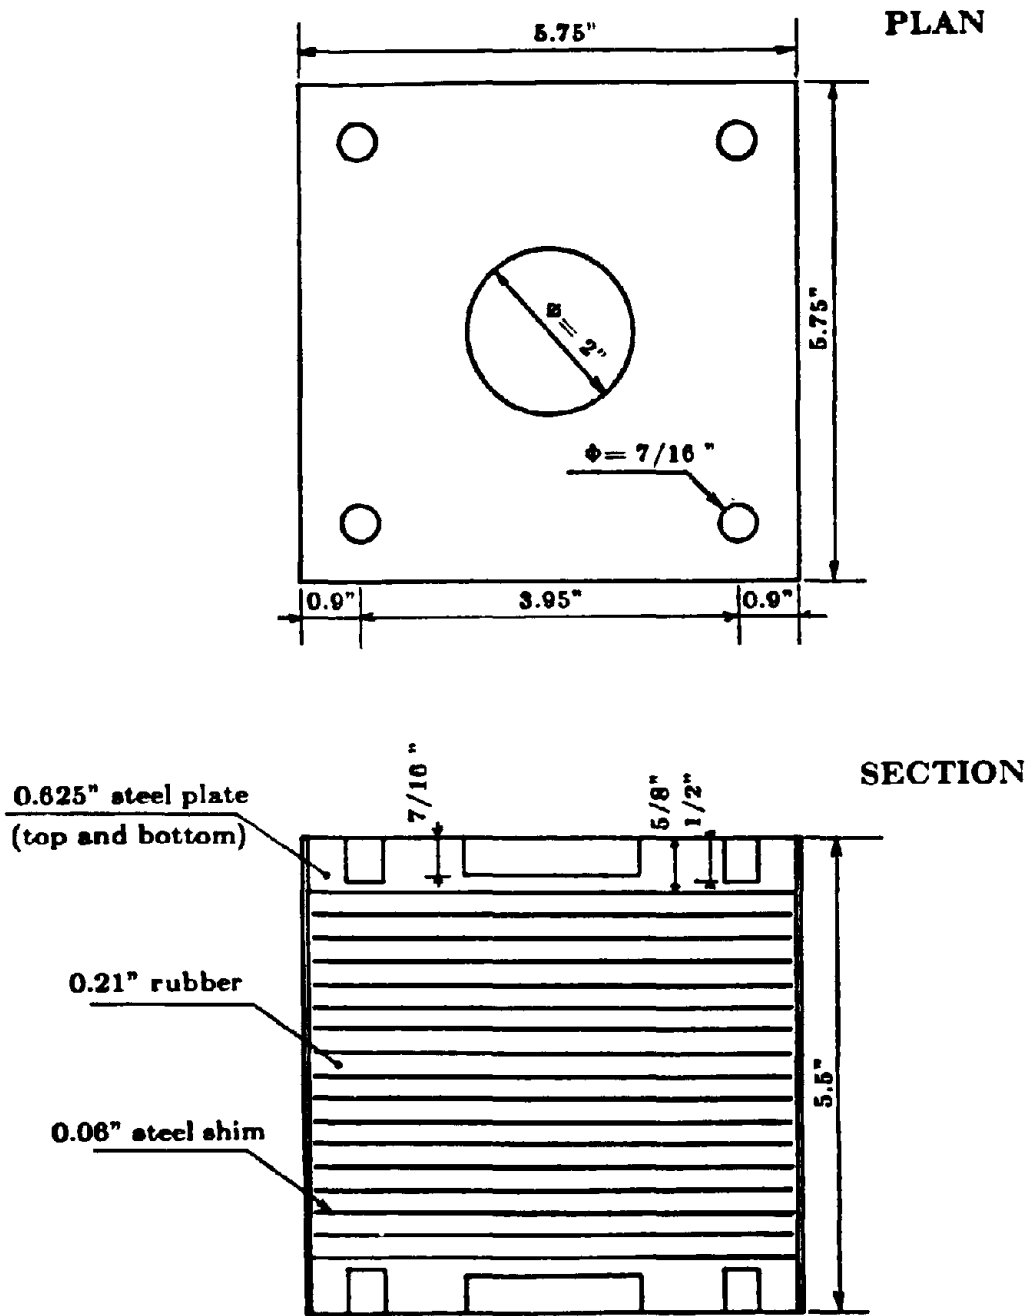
MRPRA SET #1 bearing showing dimensions.
